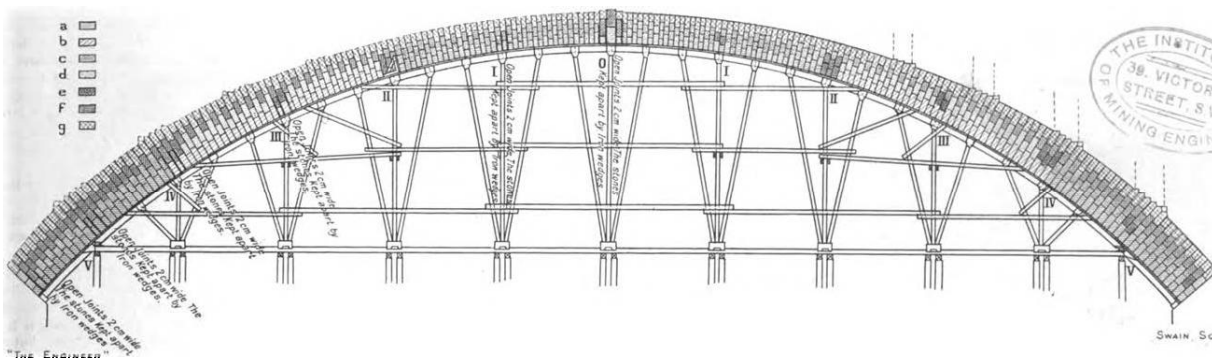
THUR BRIDGE No. 1.—METHOD OF LAYING MASONRY
